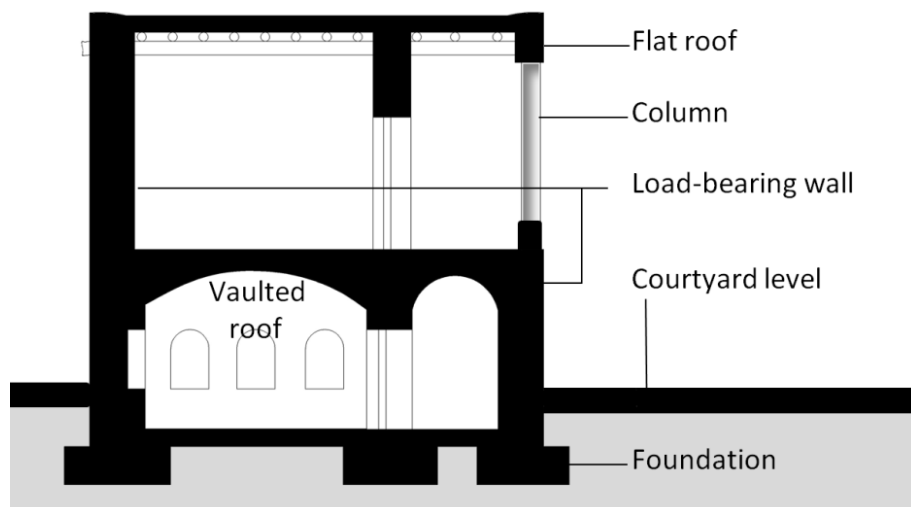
schematic structure of typical two-story Qajar houses in Sabzevar
